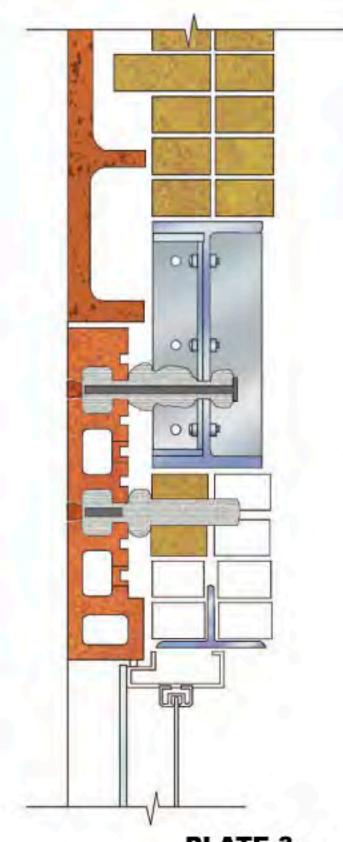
FIXING TERRA COTTA CLADDING TO STEEL SPANDREL AT WINDOW HEAD
